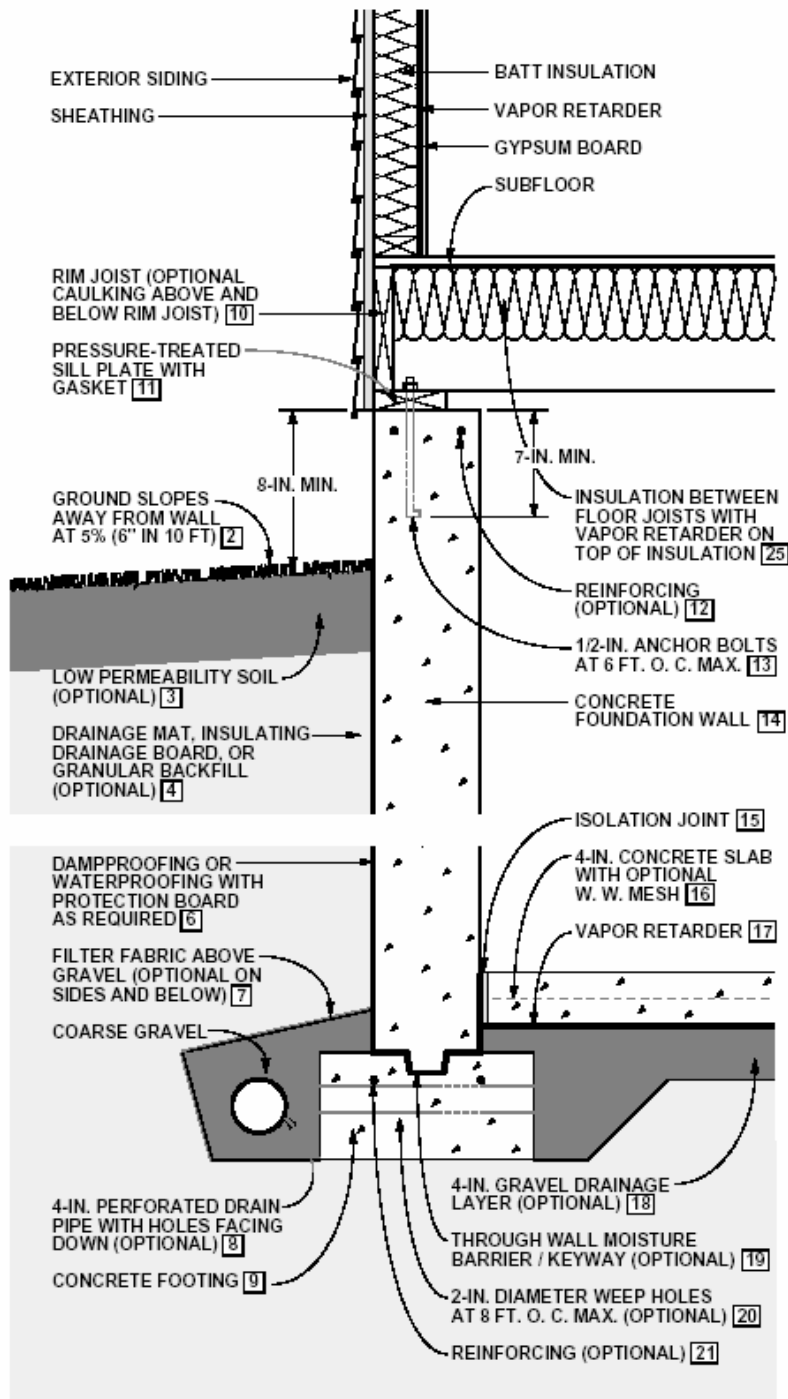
illustrates a basement with insulation placed in the ceiling between the floor joists. This approach is appropriate for an unconditioned basement. It should be used with caution in colder climates and any ducts and pipes in the basement should be insulated.
